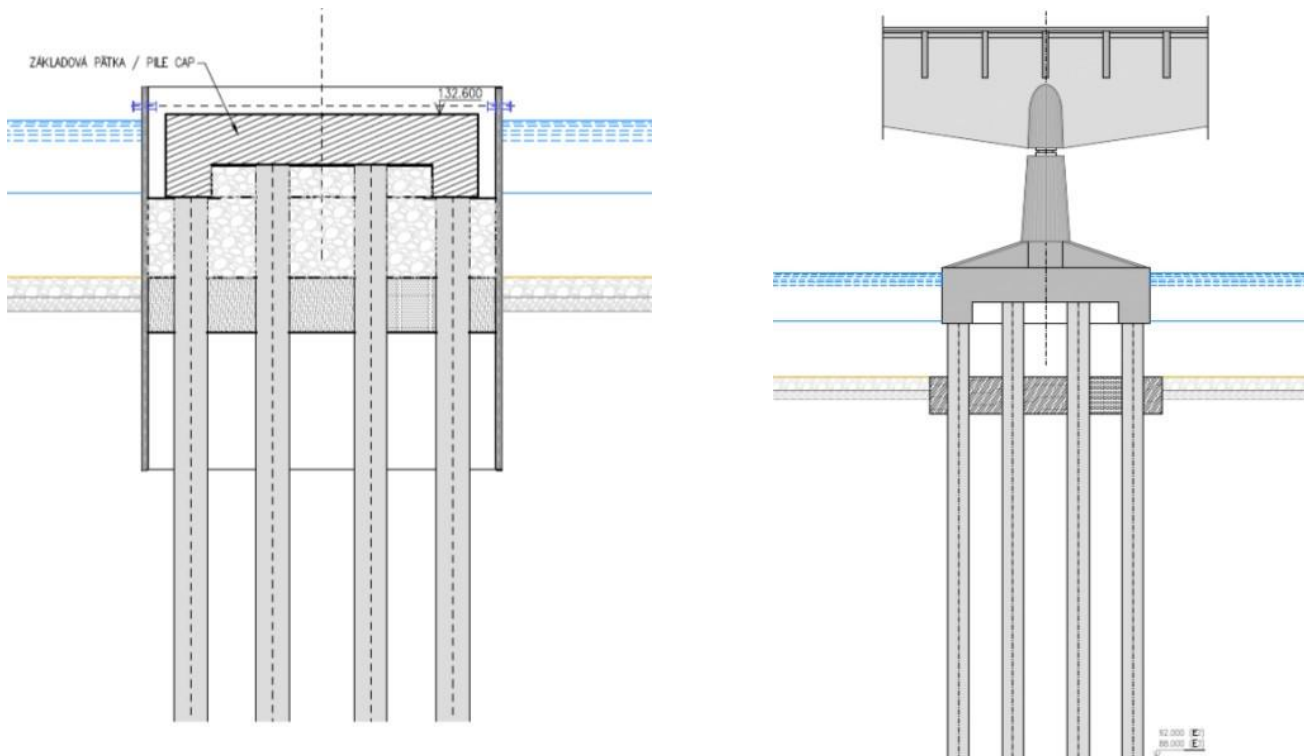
Cross section of the “construction pit” concreting of foundations (on the left); completed pier (on the right) (extract from D4R7 tender documentation)
